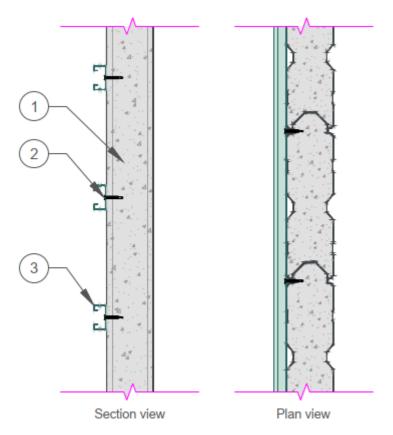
Loading applied via a fixing device to the vertically installed Speedpanel wall
